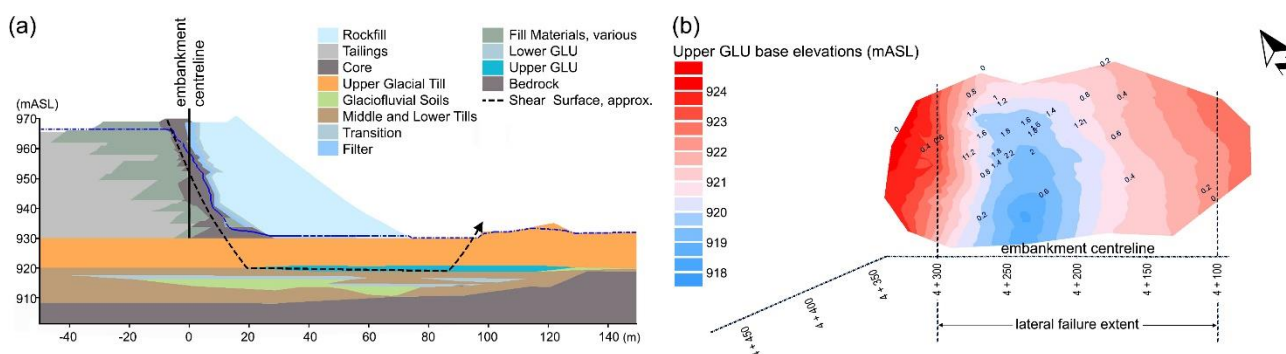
(a) Pre-failure profile of embankment and foundation soils at the failure location, based on KCB's (2015) interpretation; (b) Plan view of the Upper GLU with base elevations and labeled deposit thickness (m) showing slide extent at base.
